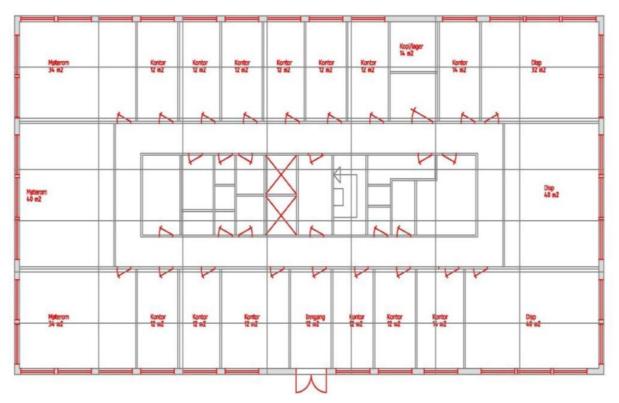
Plan drawing of one of the floors in the building. This plan drawing is representative to the other floors as well (Smedegård, 2012).
